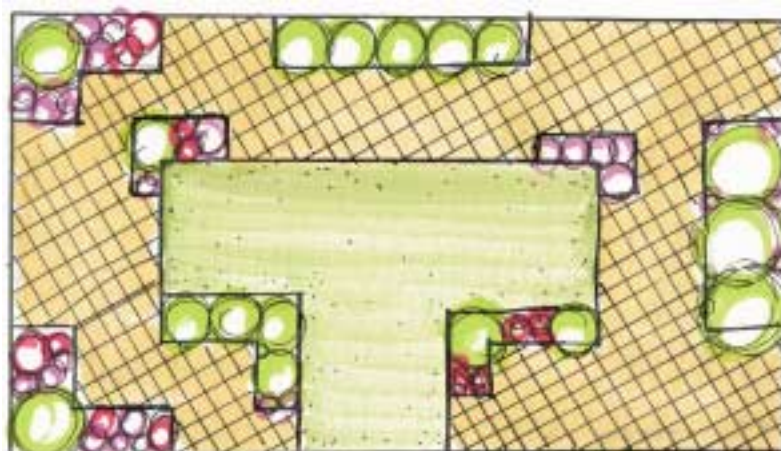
, Dover Center Road Corridor, Park Development, Design Concept Alternatives
